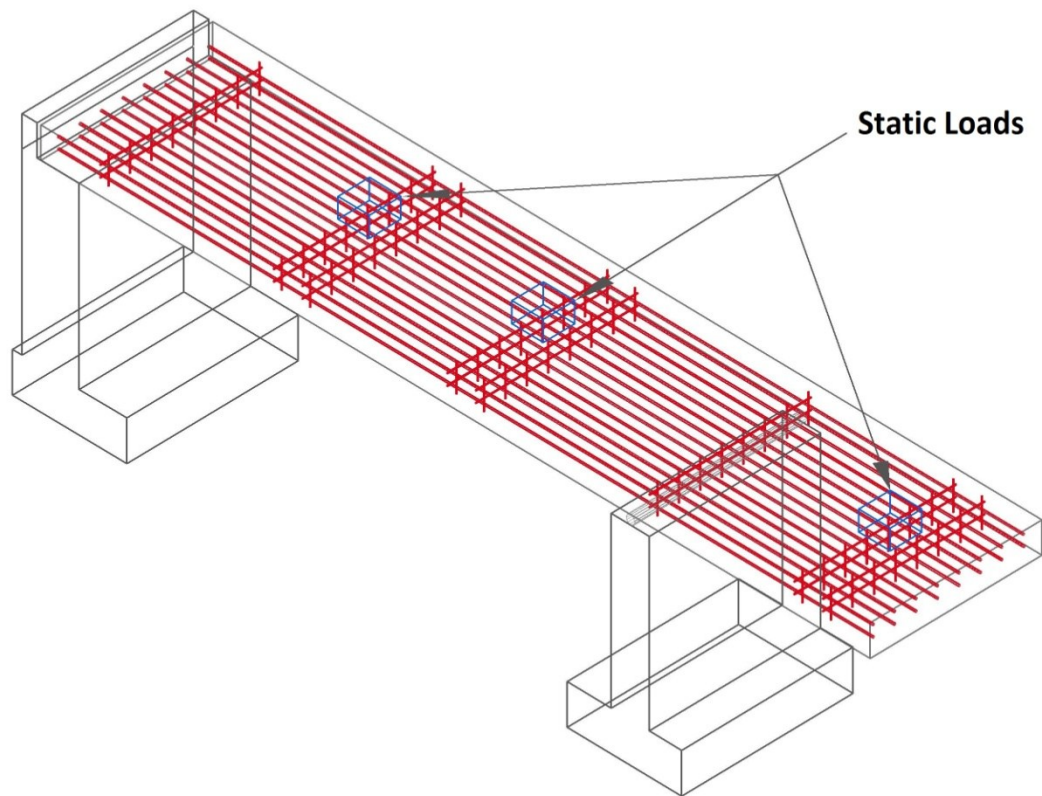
Detailed 3D view of a single reinforced concrete slab illustrating the reinforcement arrangement (in red).
